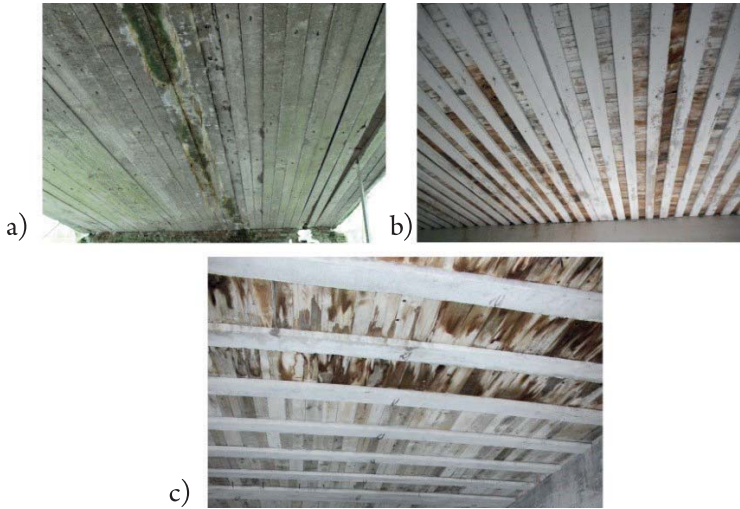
a) Different spacing of pre-tensioned beams depending on slab load and span: for contact, b, c) spaced with shuttering boards (own photos)
